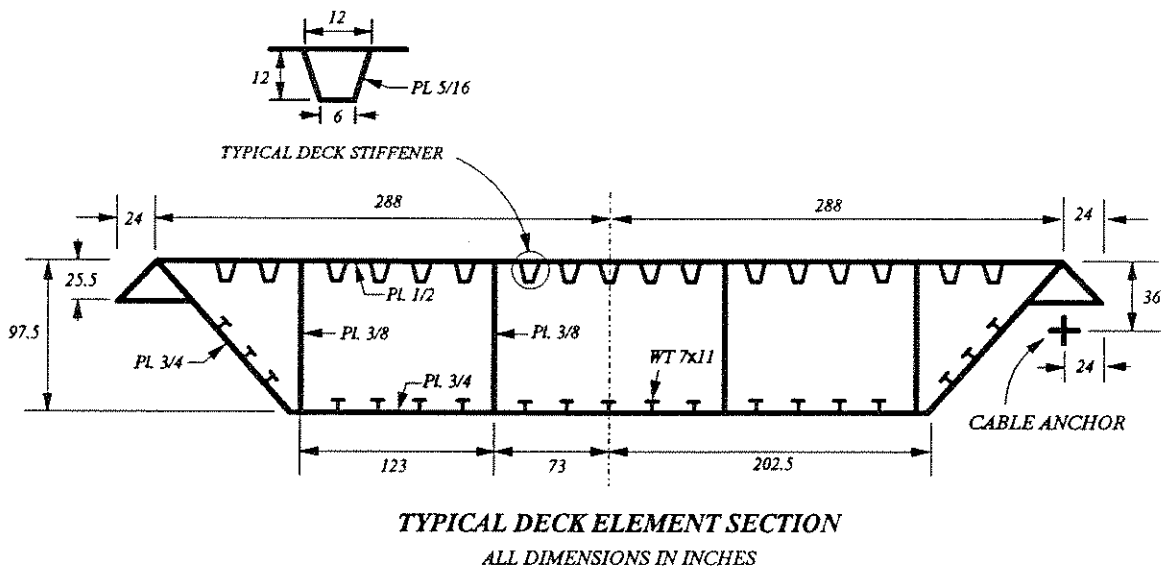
TYPICAL DECK ELEMENT AND POSITION OF CABLE ANCHOR
